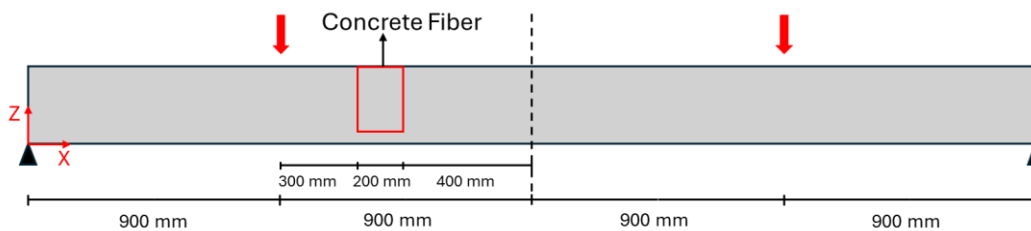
Side view of Slab 12, highlighting the location of the concrete Fiber.
